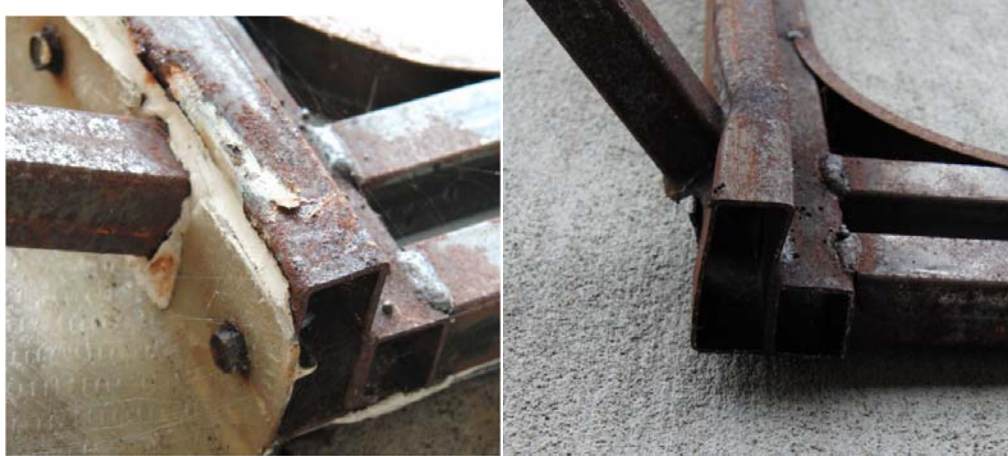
Mode of failure for roof to wall connections at vertical roof member.
